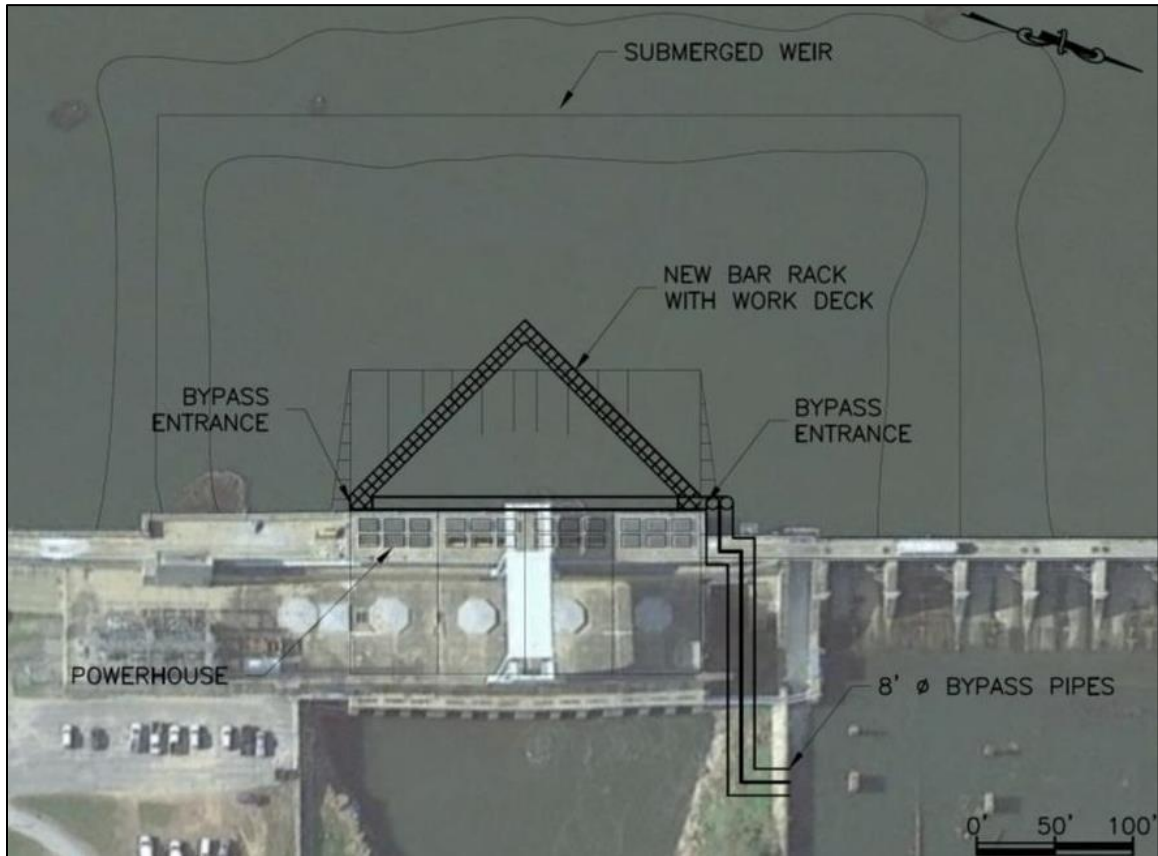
Conceptual design of an angled bar rack installed at Roanoke Rapids (plan view).
